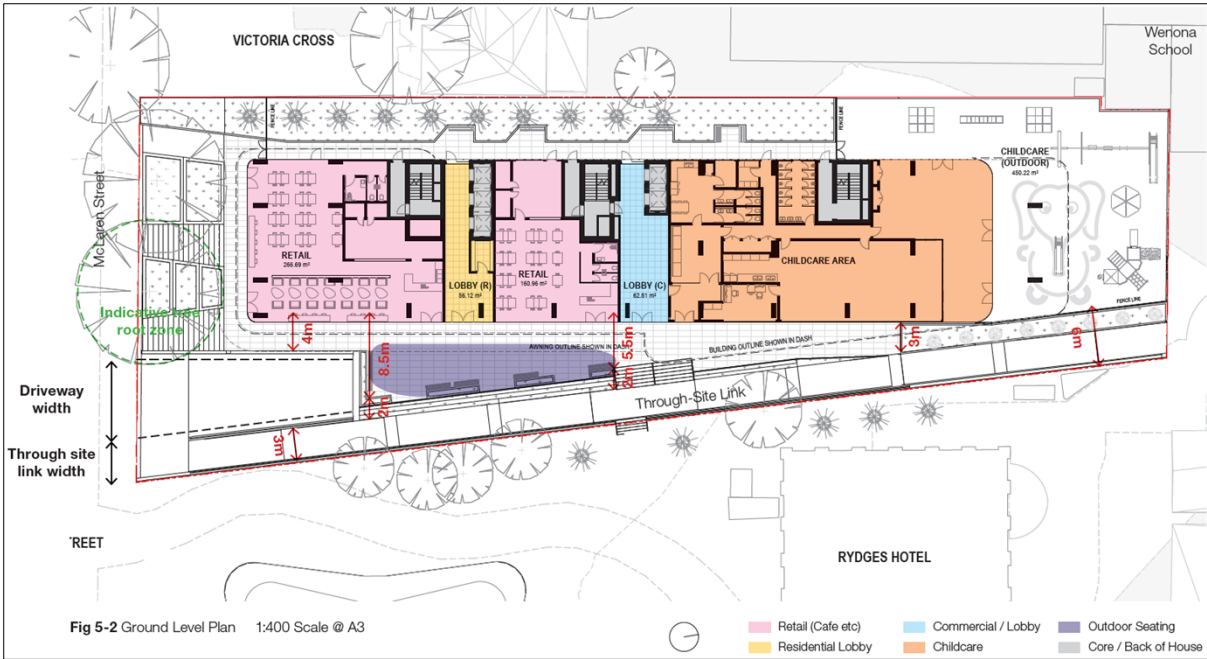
Proposed Ground Floor Plan (Applicant's Urban Design Report, p.47)
